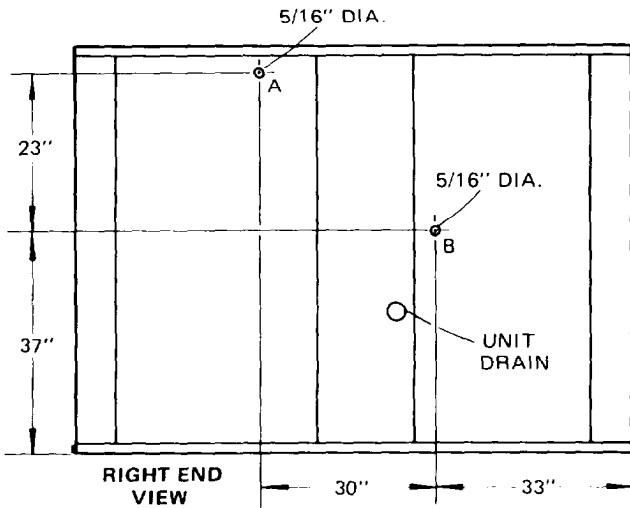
HOLE LOCATIONS FOR SUPPLY AIR CFM CHECK
